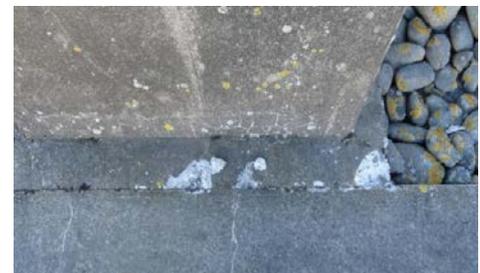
Concrete spalling at base of chimney, (looking downward)
